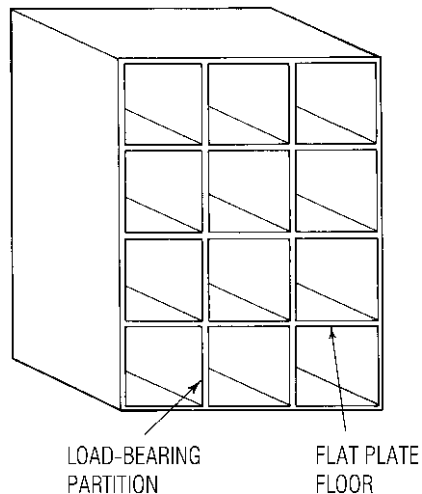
Load-bearing partitions support flat-plate floors in an apartment building.
